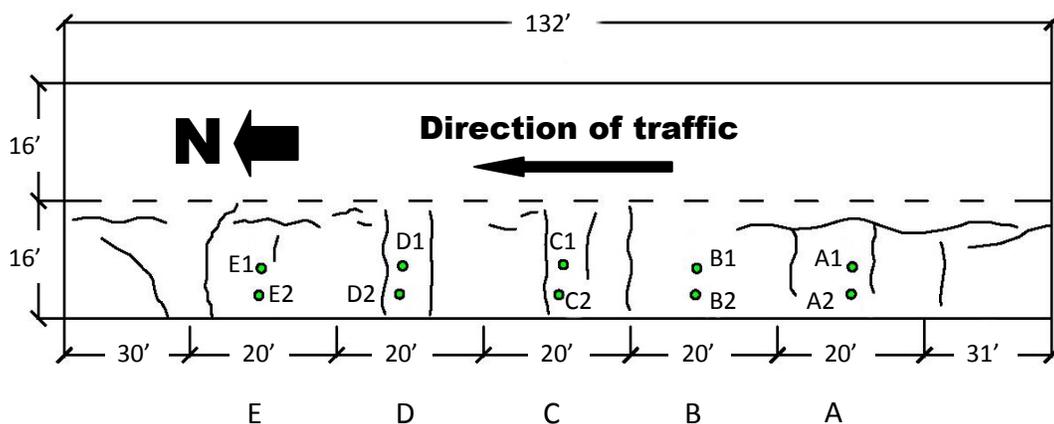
Dimensions, crack pattern, and sample retrieval location on the left lane of bridge B-13-0034.
